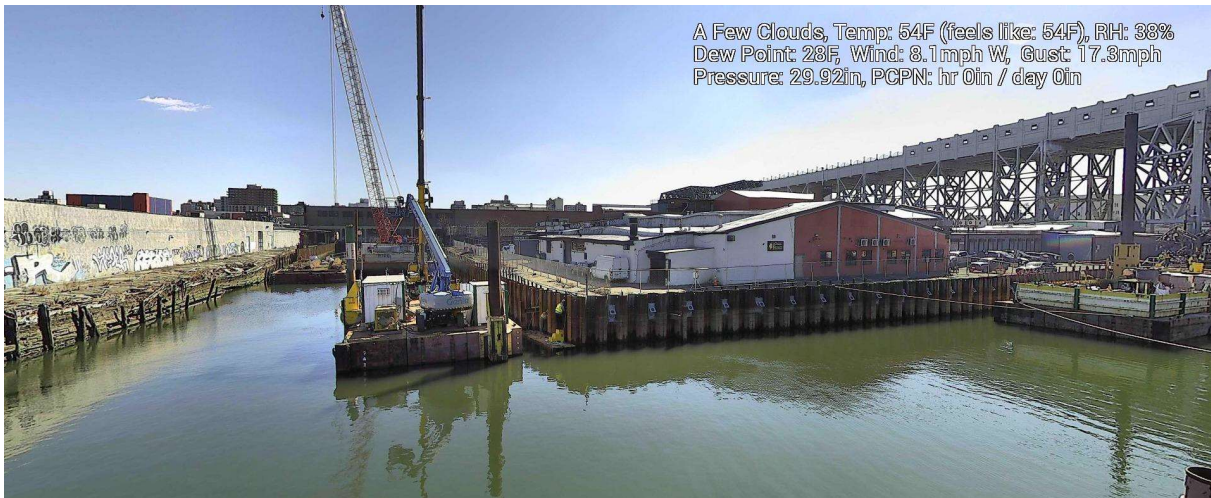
February 26, 2025. General Conditions in Canal north of 9th Street Bridge near TB6 during in-waterway construction activities.
